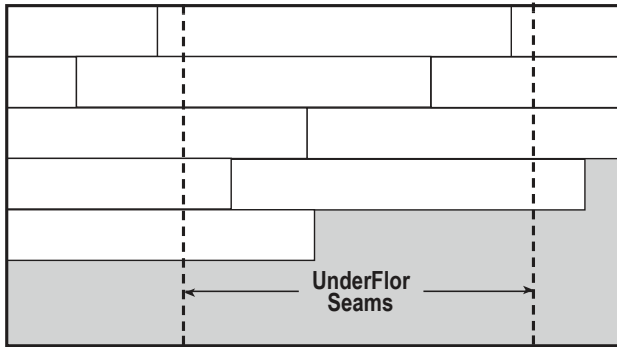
Install UnderFlor perpendicular to tile and plank.
